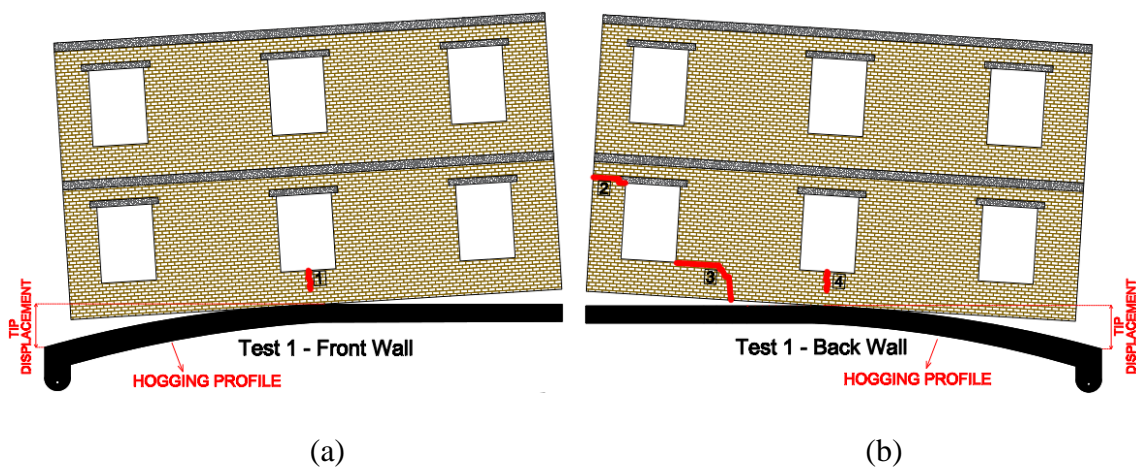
Schematic views of parallel walls and cracks on their surfaces after Test 1: (a) front wall of the reference specimen, (b) back wall of the reference specimen.
